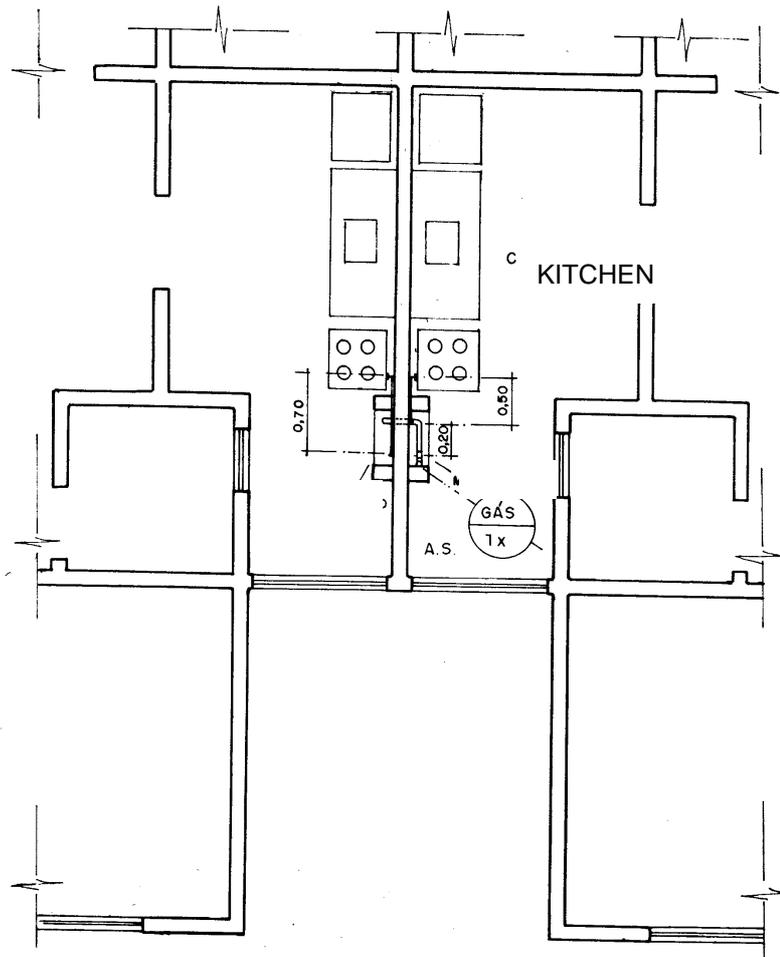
TYPICAL PAVEMENT – INSTALLATIONS WITH REMOTE METERING SYSTEM
